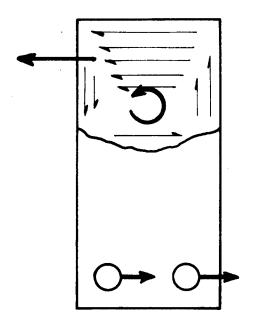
FORCES IN SECTION RESISTING T_{C} AFTER CRACKING.
